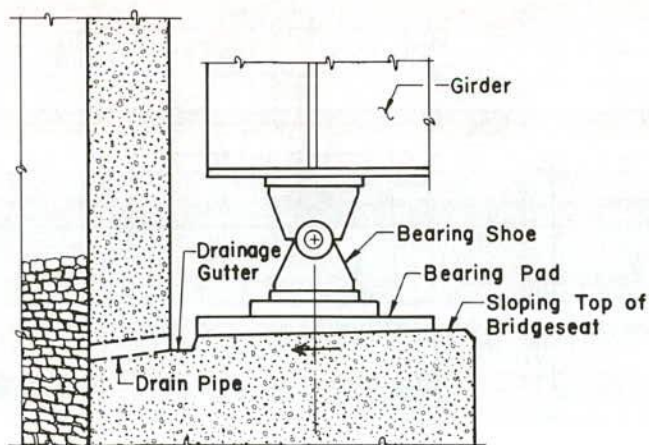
Sloped abutment cap and drain. [Bethlehem Steel Corporation 1983]
